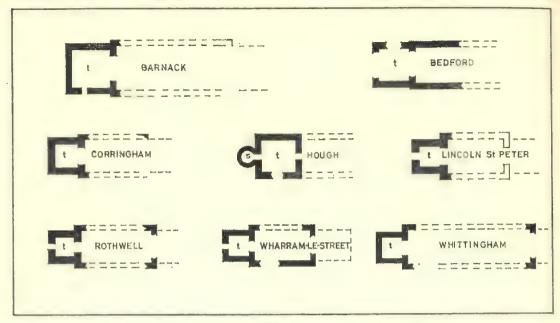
WEST TOWERS WITH INCOMPLETELY DEFINED CHURCH PLANS
